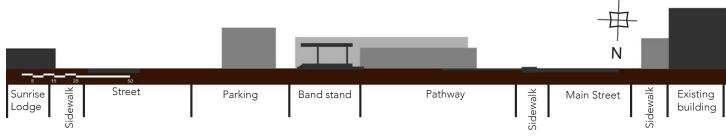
At street level looking south at a town square that links Main Street to future rail yard development
